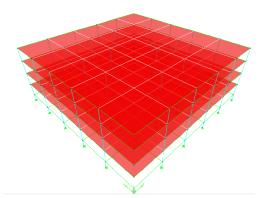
Model 2: 3D Model of flat plate of G+3 storey building
